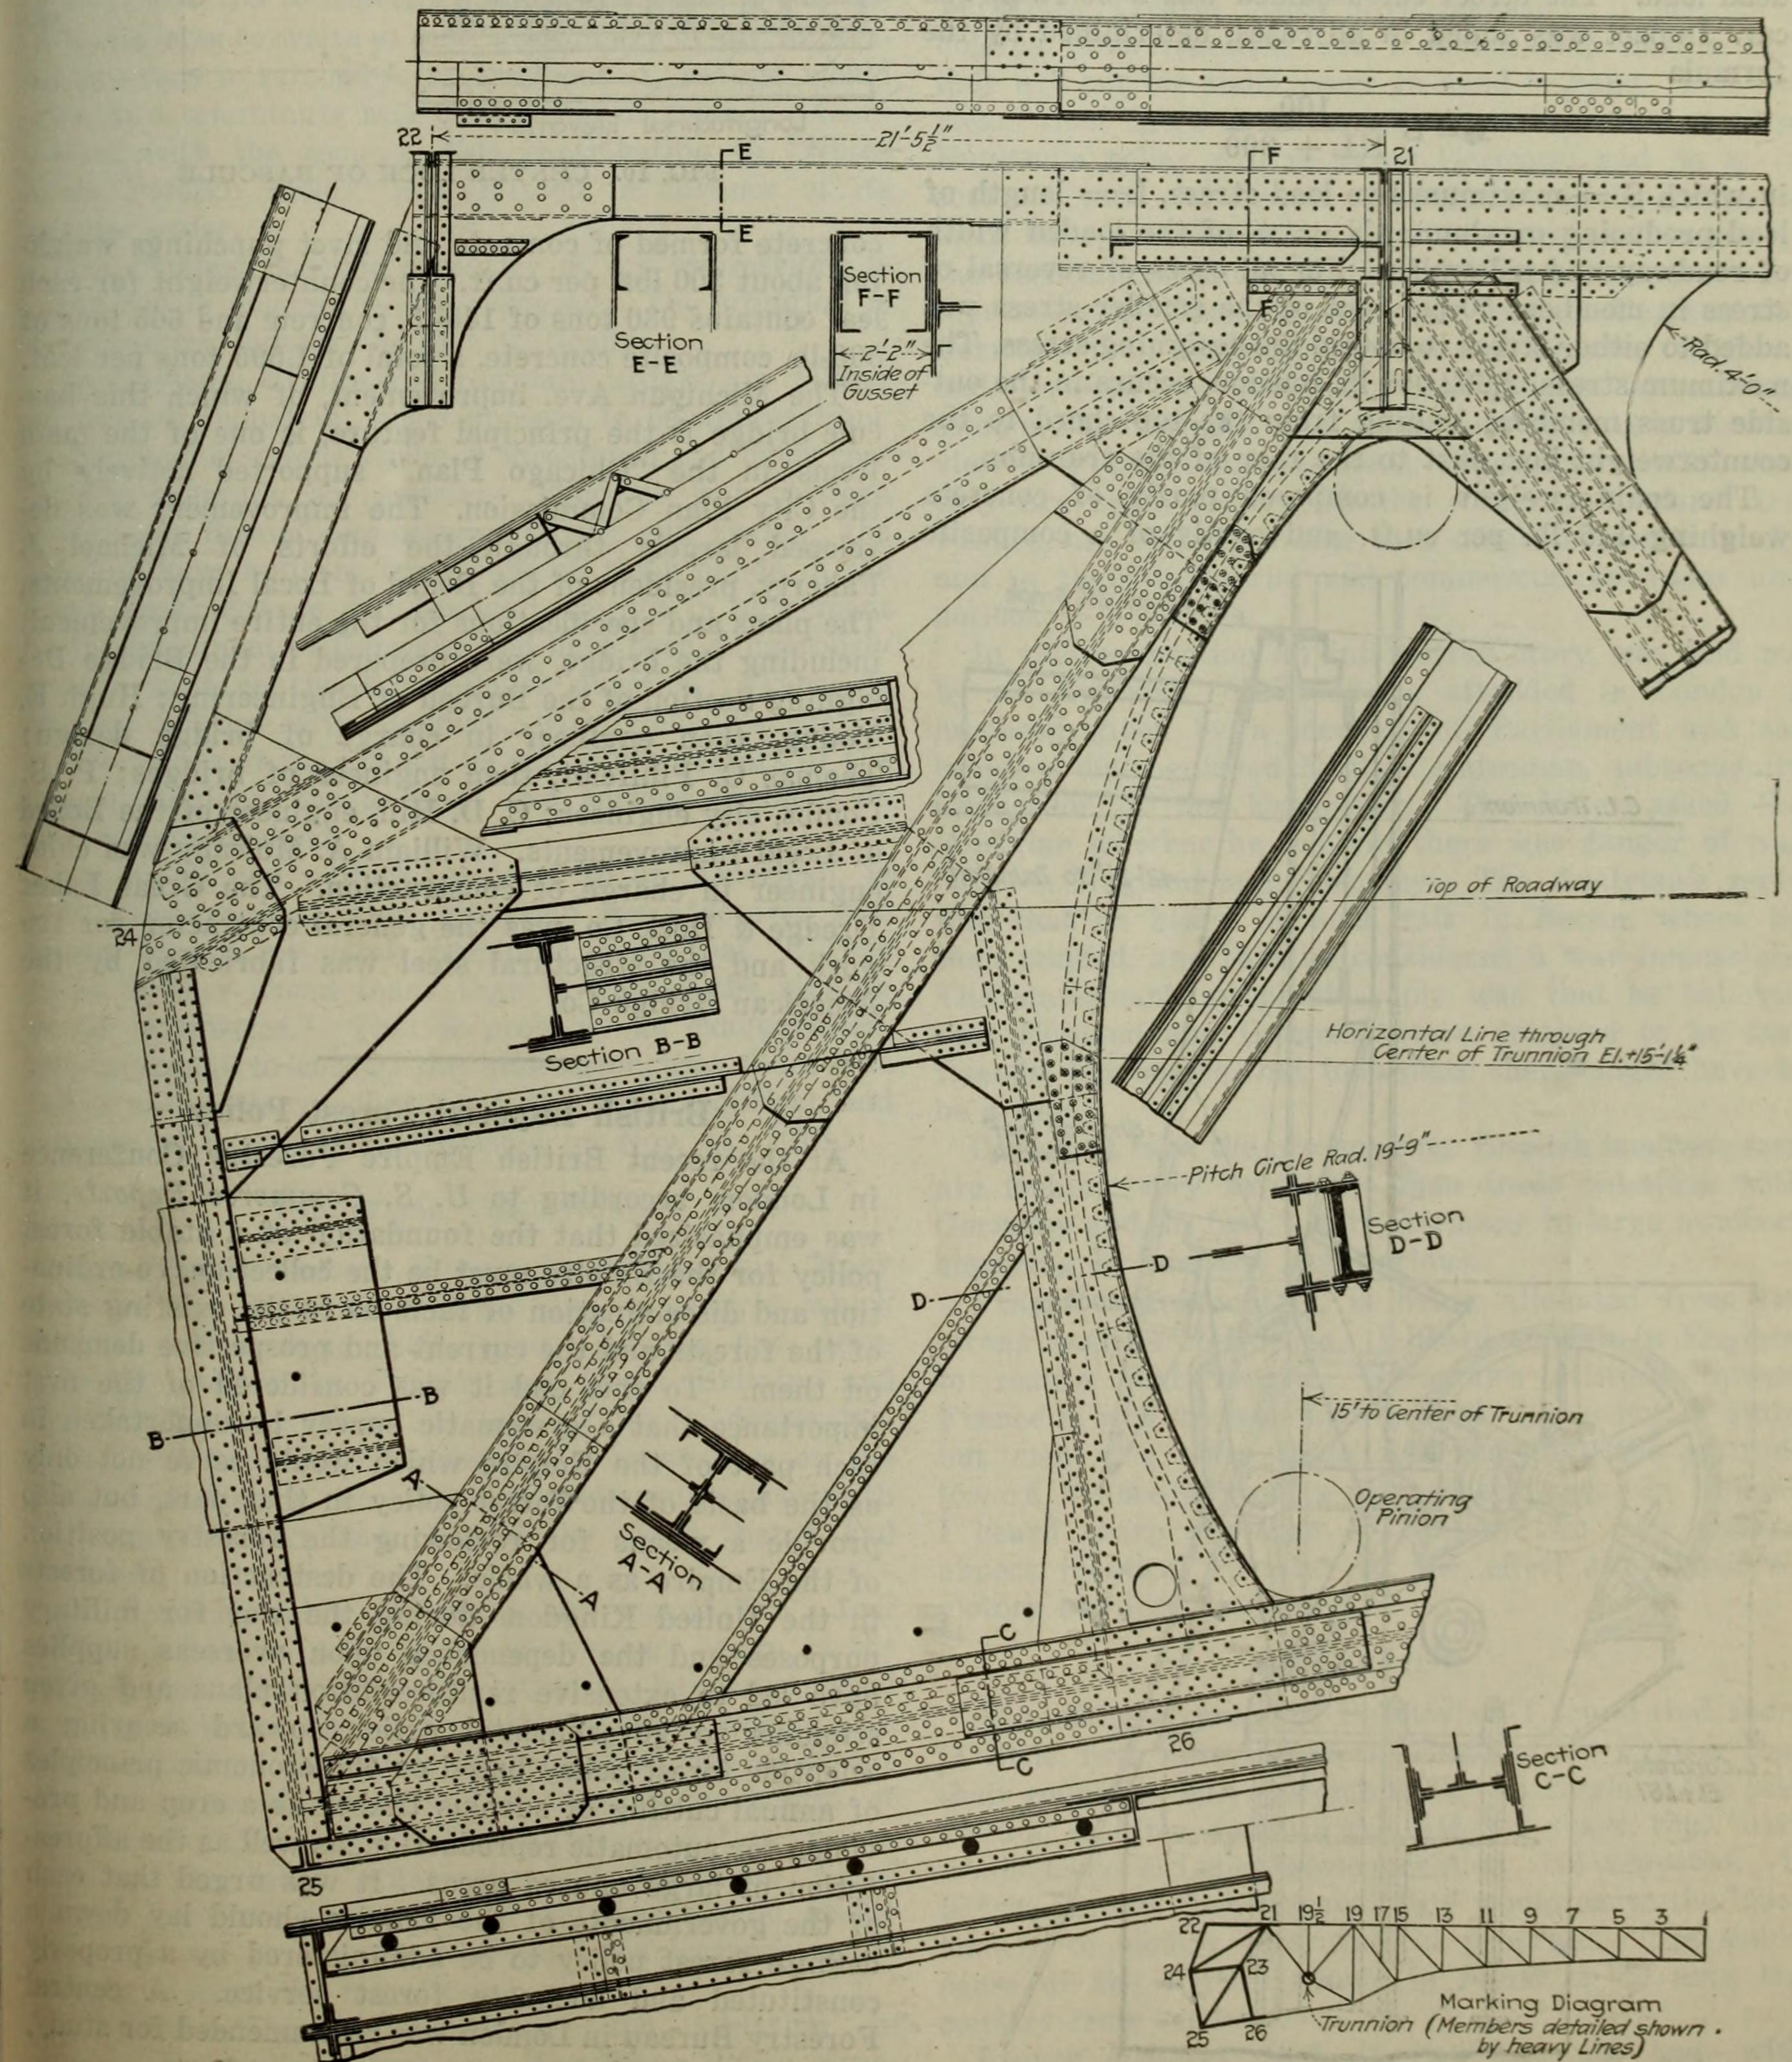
HEEL OF DOUBLE-DECK TRUSS, WITH OPERATING RACK
